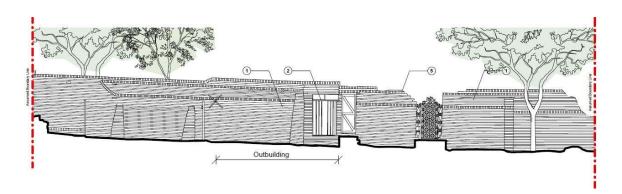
Existing front elevation as viewed from No. 22 Frognal Way
